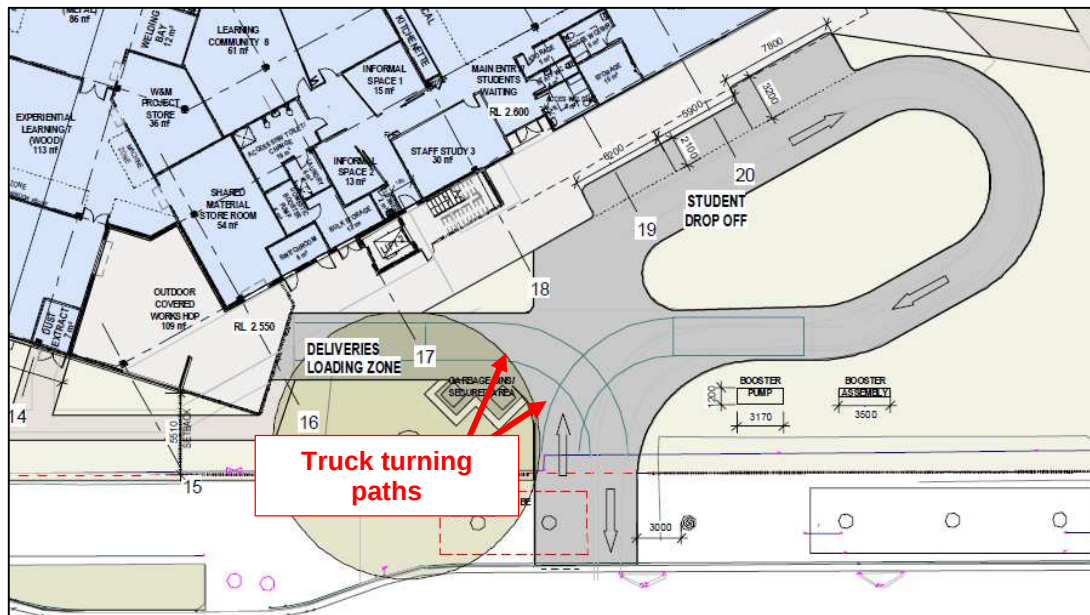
Proposed driveway from Swift Street, loading area and Support Unit drop-off/pick-up
